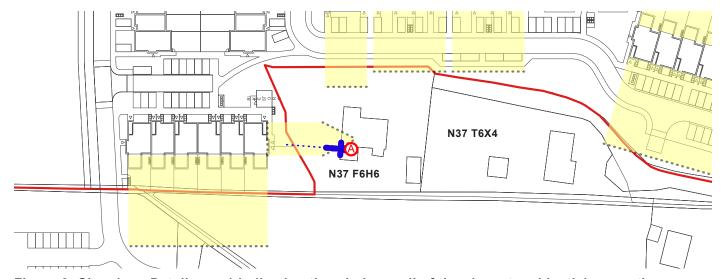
Site plan - Detail area 1 indicating the window wall of the closest residential properties.
